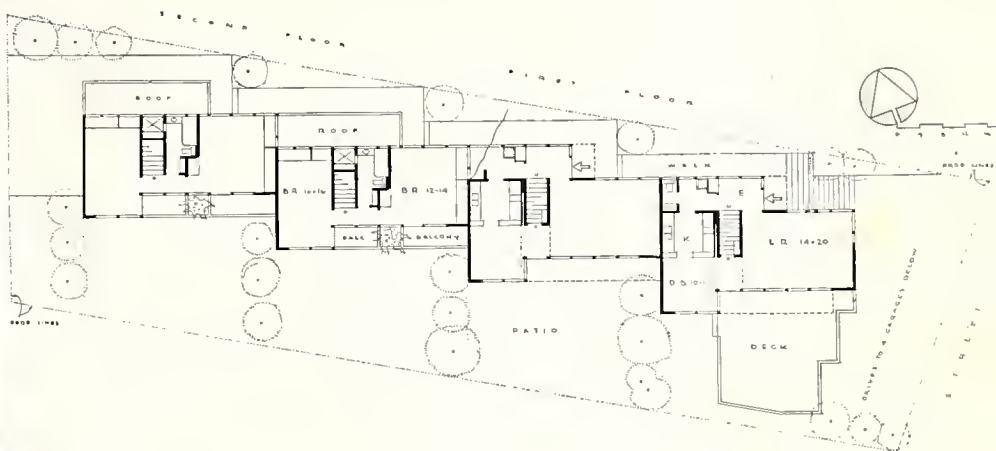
The Dunsmuir Flat Building, Los Angeles, Calif. Gregory Ain, architect. An arrangement of duplexes, staggered for privacy. Each unit is a complete home with access to its own patio. All rooms have good ventilation and sunlight.
